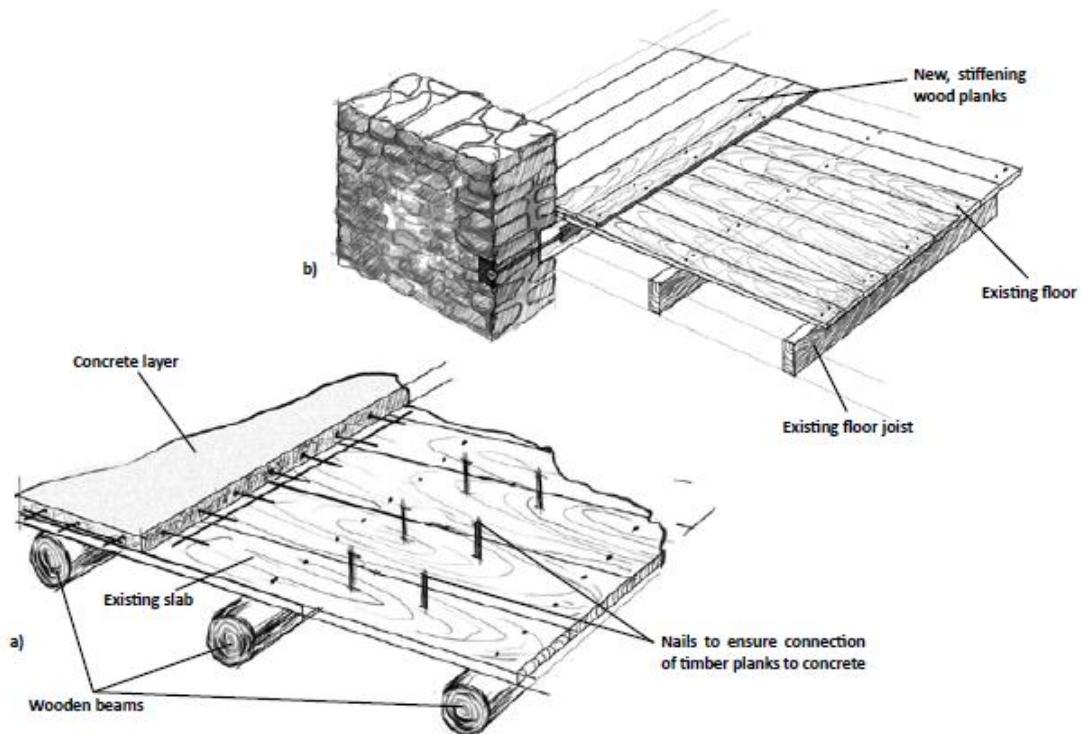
Stiffening the floor structures: a) RC topping, and b) new timber planks (source: UNIDO 1983)
